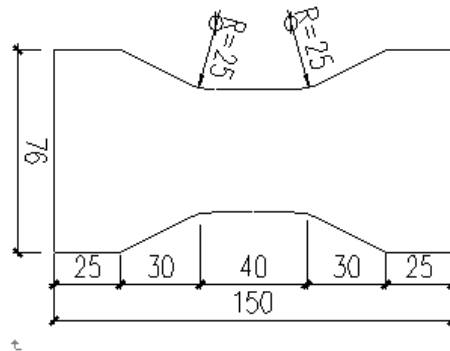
Geometry of ECC specimen for direct tensile test (dimensions in mm)
